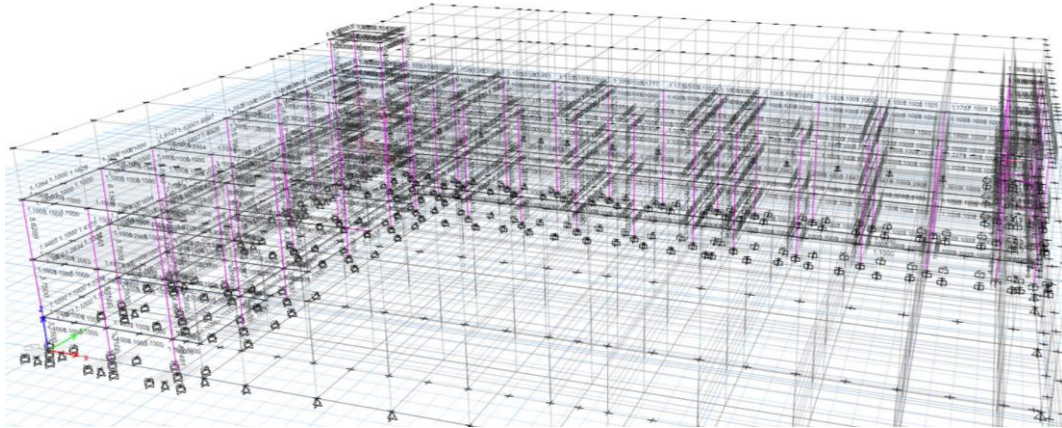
3D Dimension Beam Rebar Profile
